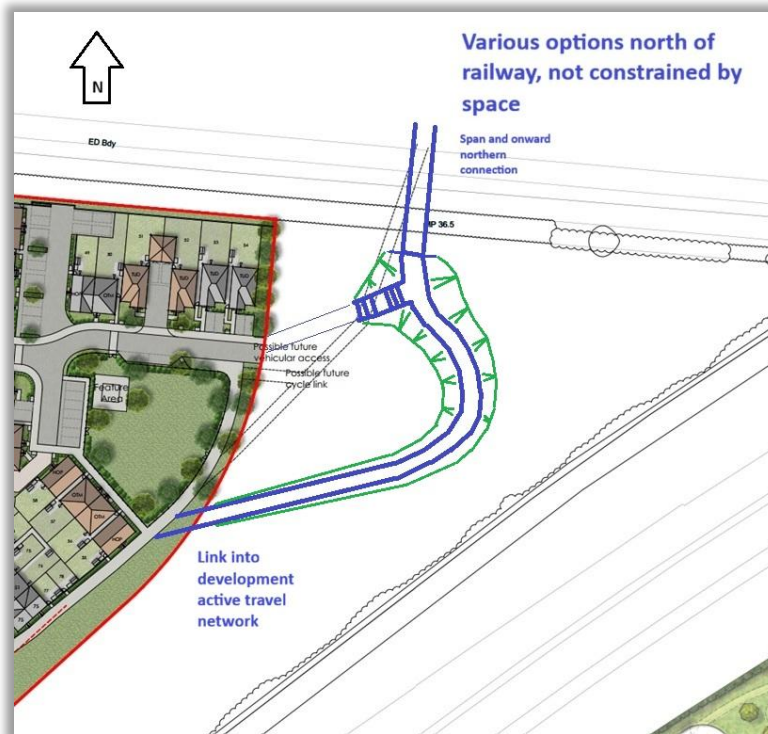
D – indicative layout of earth ramp south of railway, demonstrating flexibility of land take for structure within the safeguarded land and multiple points of connection to proposed path network
